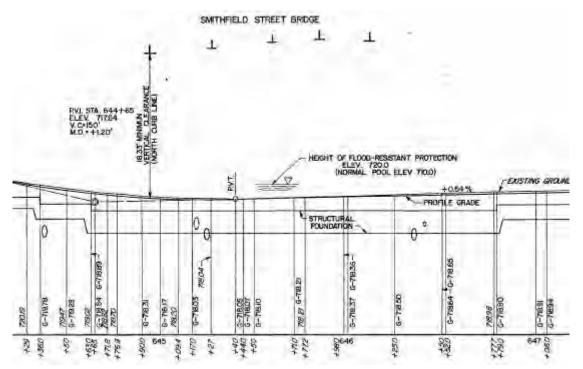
Ramp D Profile at Smithfield Street Bridge
